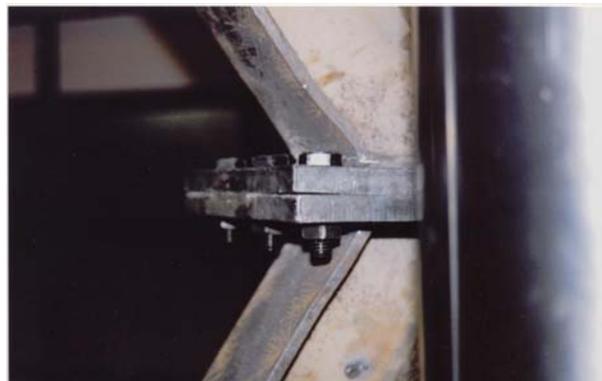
Local buckling of lower flange of the upper segment of the 2nd test assembly with HE-A100 sections.
